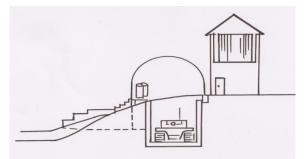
Side elevation of Amphibious Training Well. The site was on a hill side, making excavation of the tank chamber easier from an engineering point of view.
